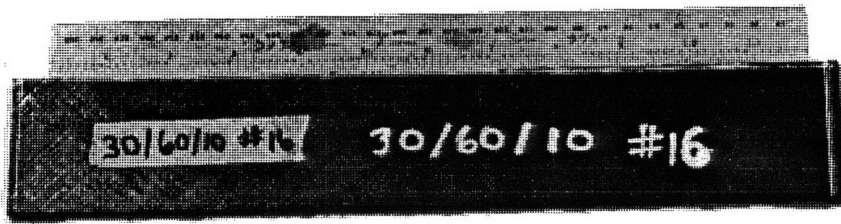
Picture of specimen T30/60/10-15 before testing.
